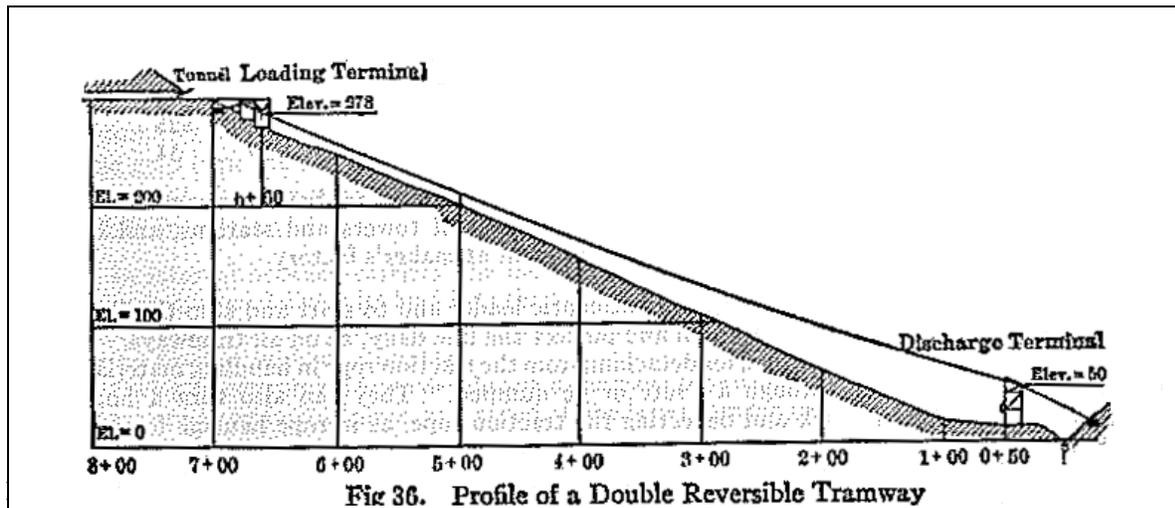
Diagram of Double Reversible Tramway Used for Mining Ores (Peele 1927:1784).
